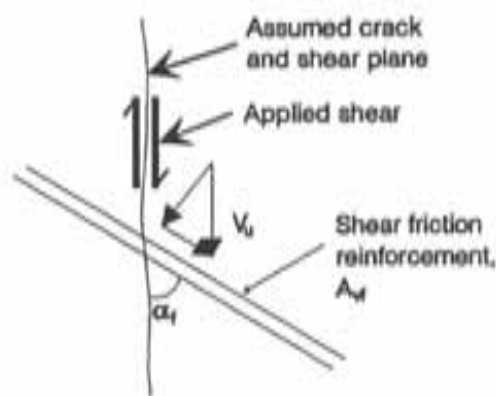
Shear-friction reinforcement at an angle to assumed crack
